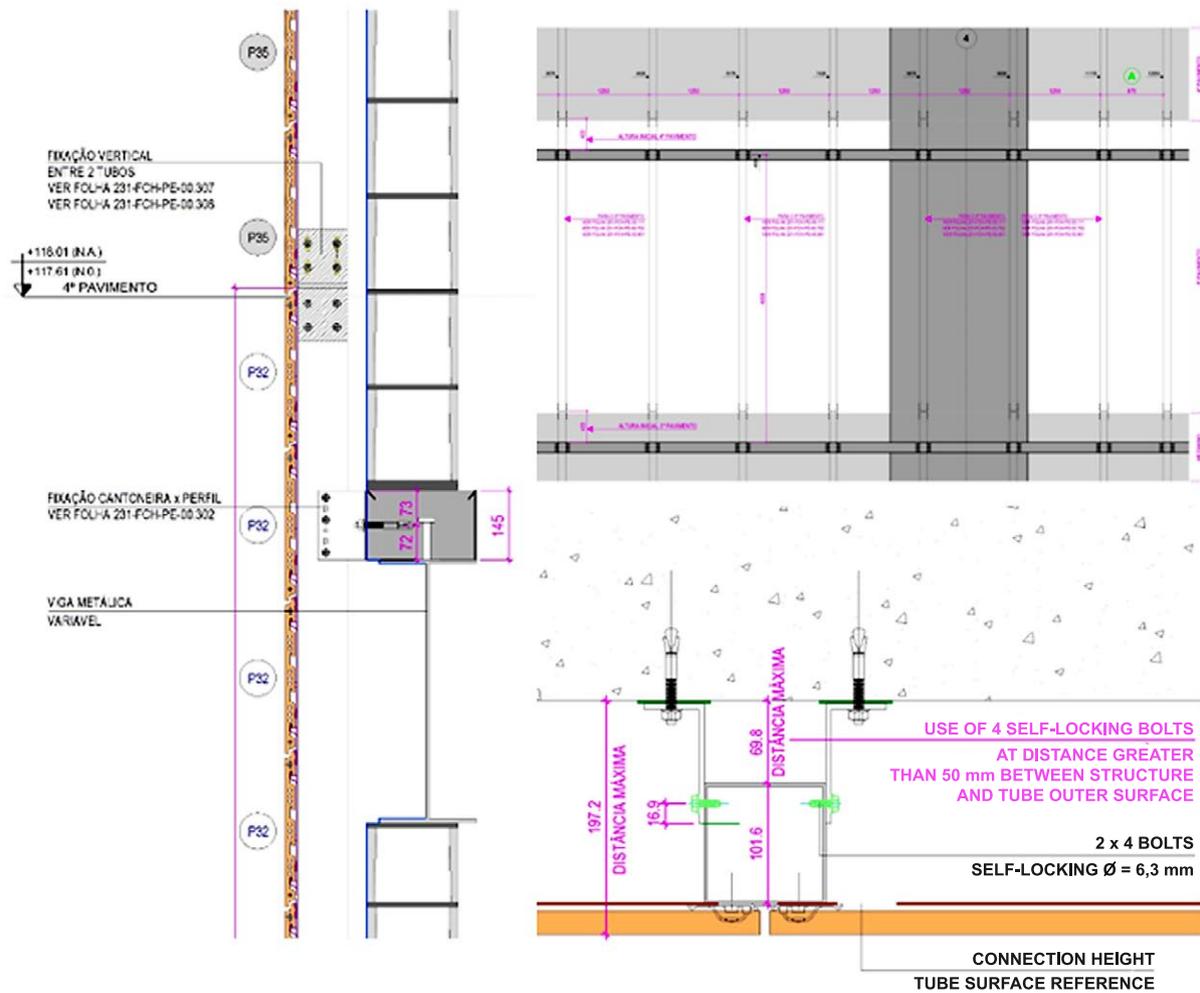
Ventilated system detailing: tube profile connected to the structure by angles and stainless steel bolts.
